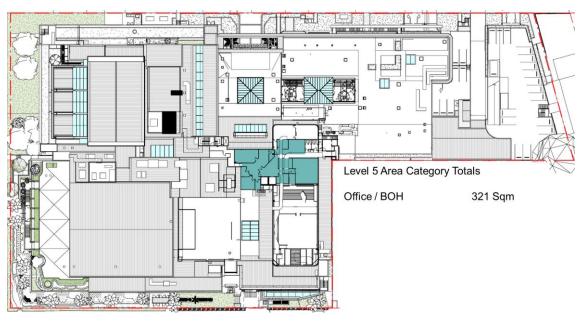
Proposed Level 5 layout (Source: Altis Architecture)
